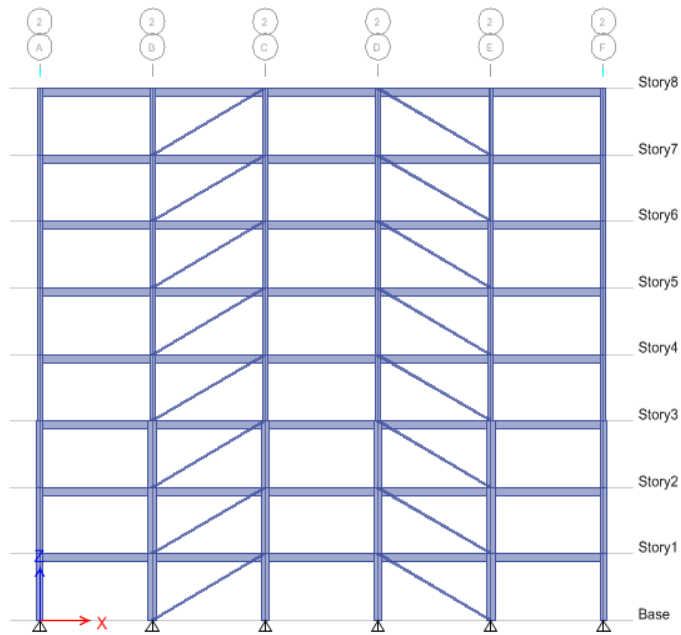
Typical I-beam and bracing elevation of the dormitory building (IR8F-I) in x-direction.
